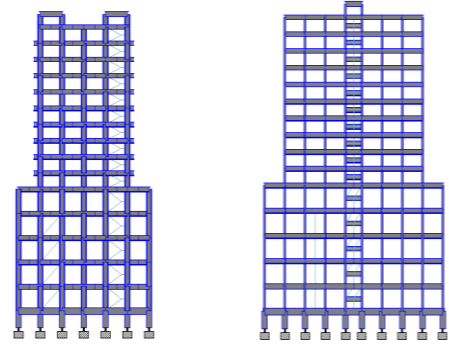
Elevation View of Proposed Structure (Without Damper M)
